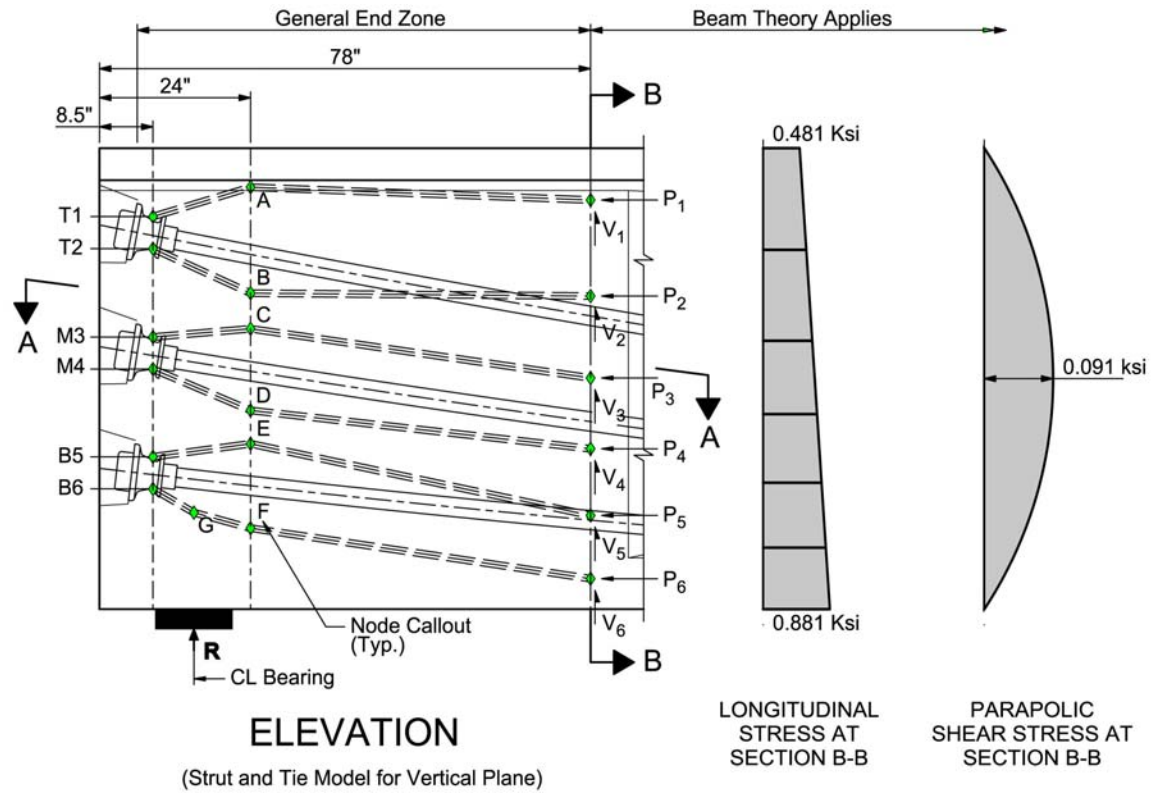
Strut and Tie Models for a Post-Tensioned Girder
